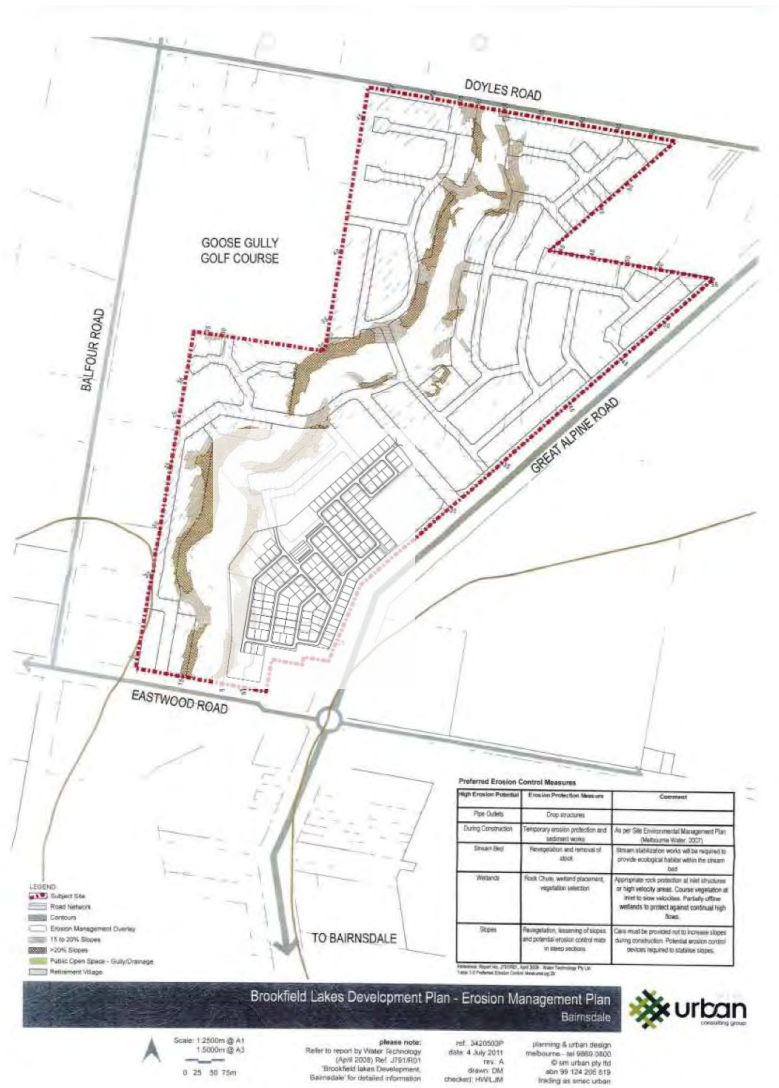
Indicative Erosion Management Plan⁶ / Concept Site Layout Nov 2023 Overlay
